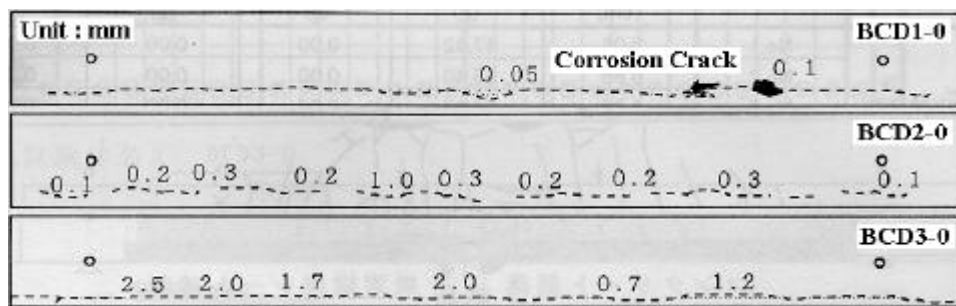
Cracks in concrete cover due to rebar corrosion
